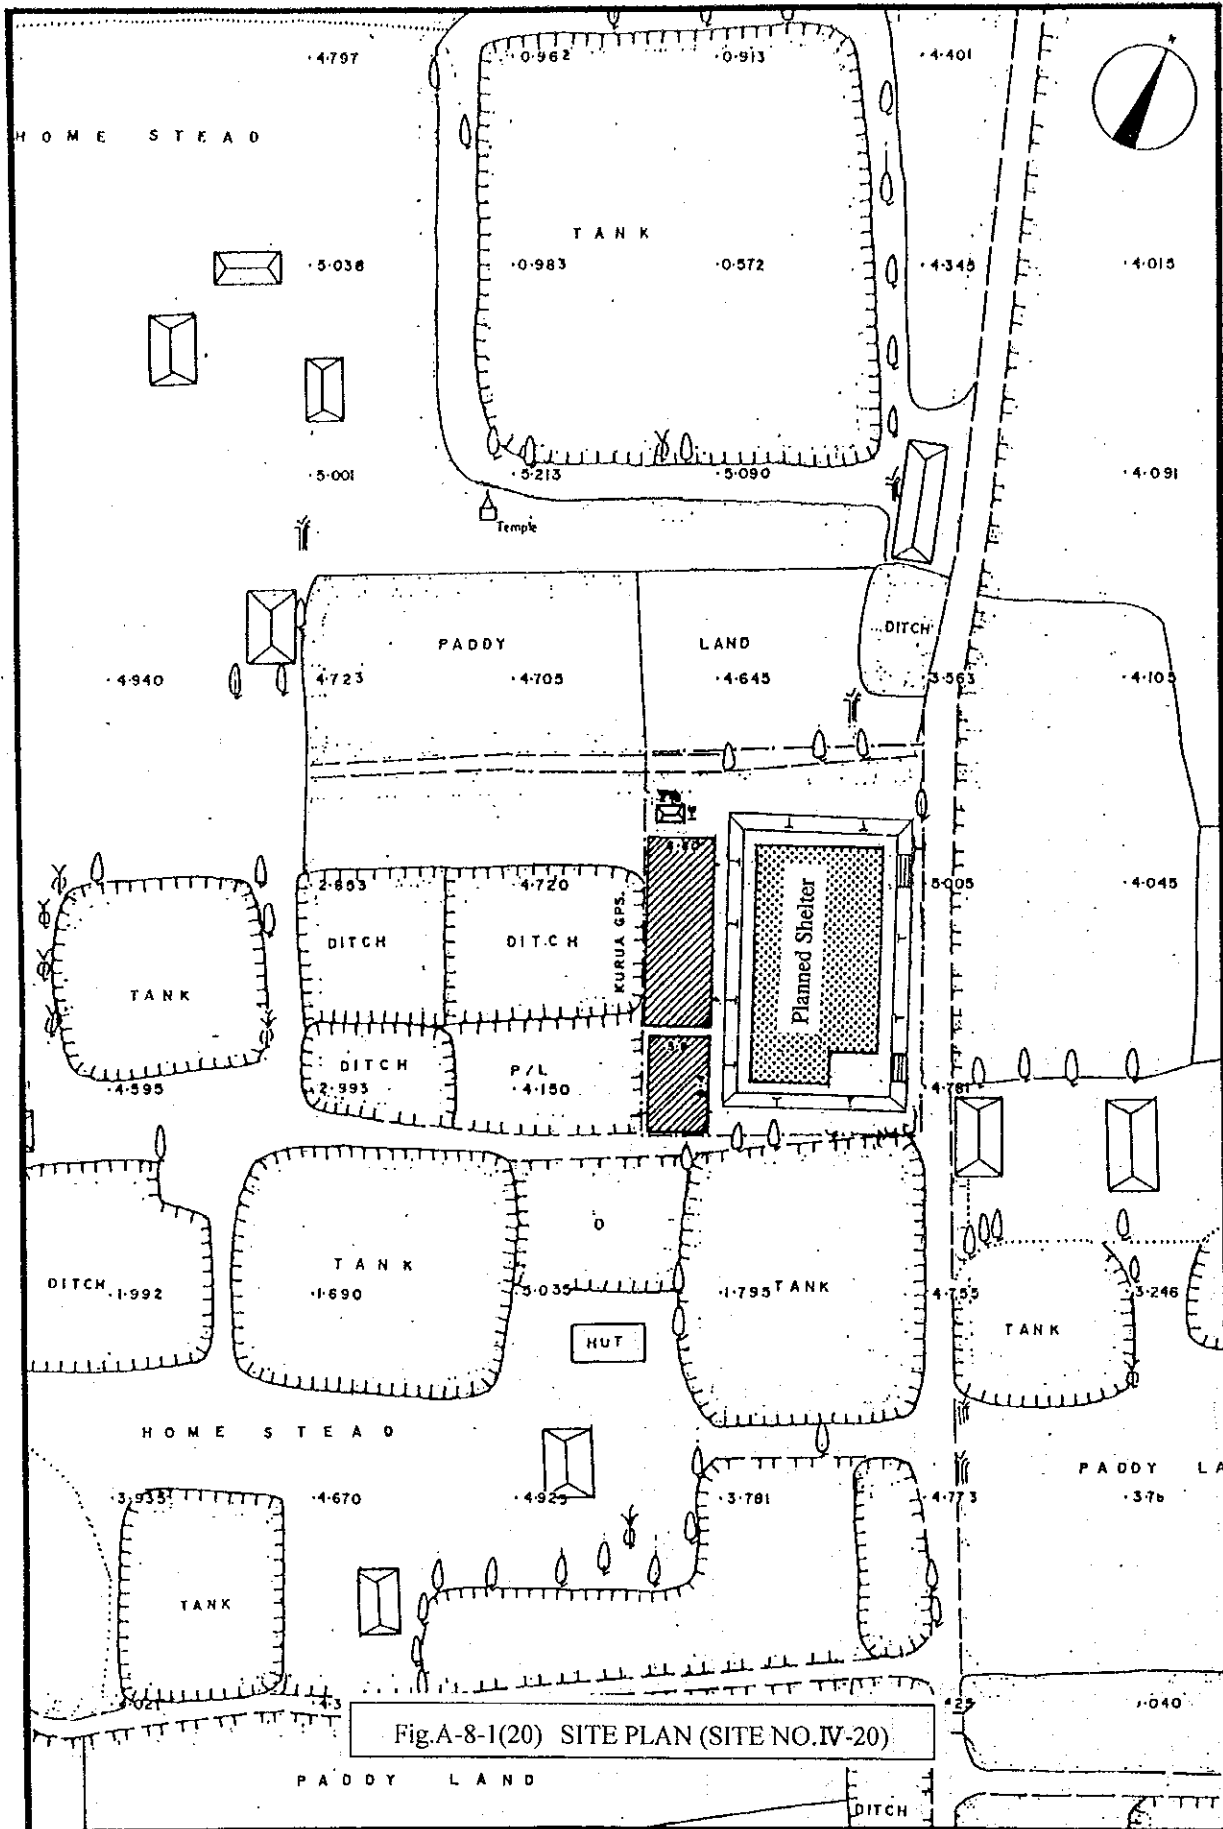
(20) SITE PLAN (SITE NO.IV-20)
